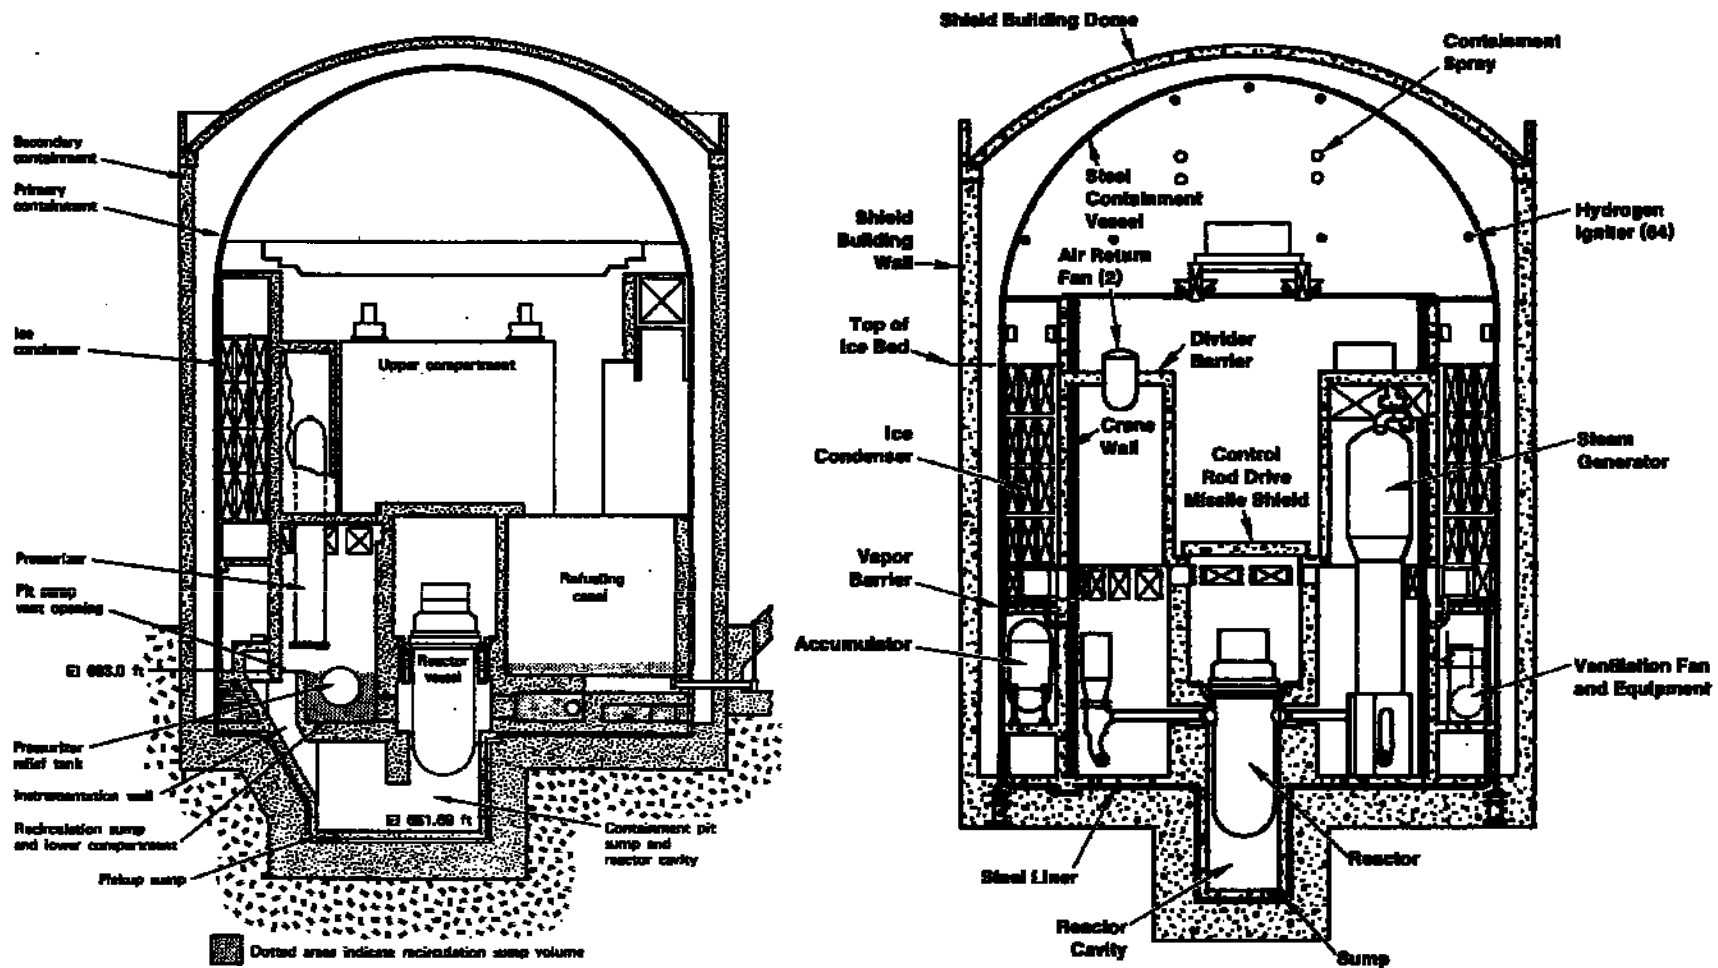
Typical PWR Ice Condenser Steel Containment with Concrete Shield Building (e.g. Sequoyah)
